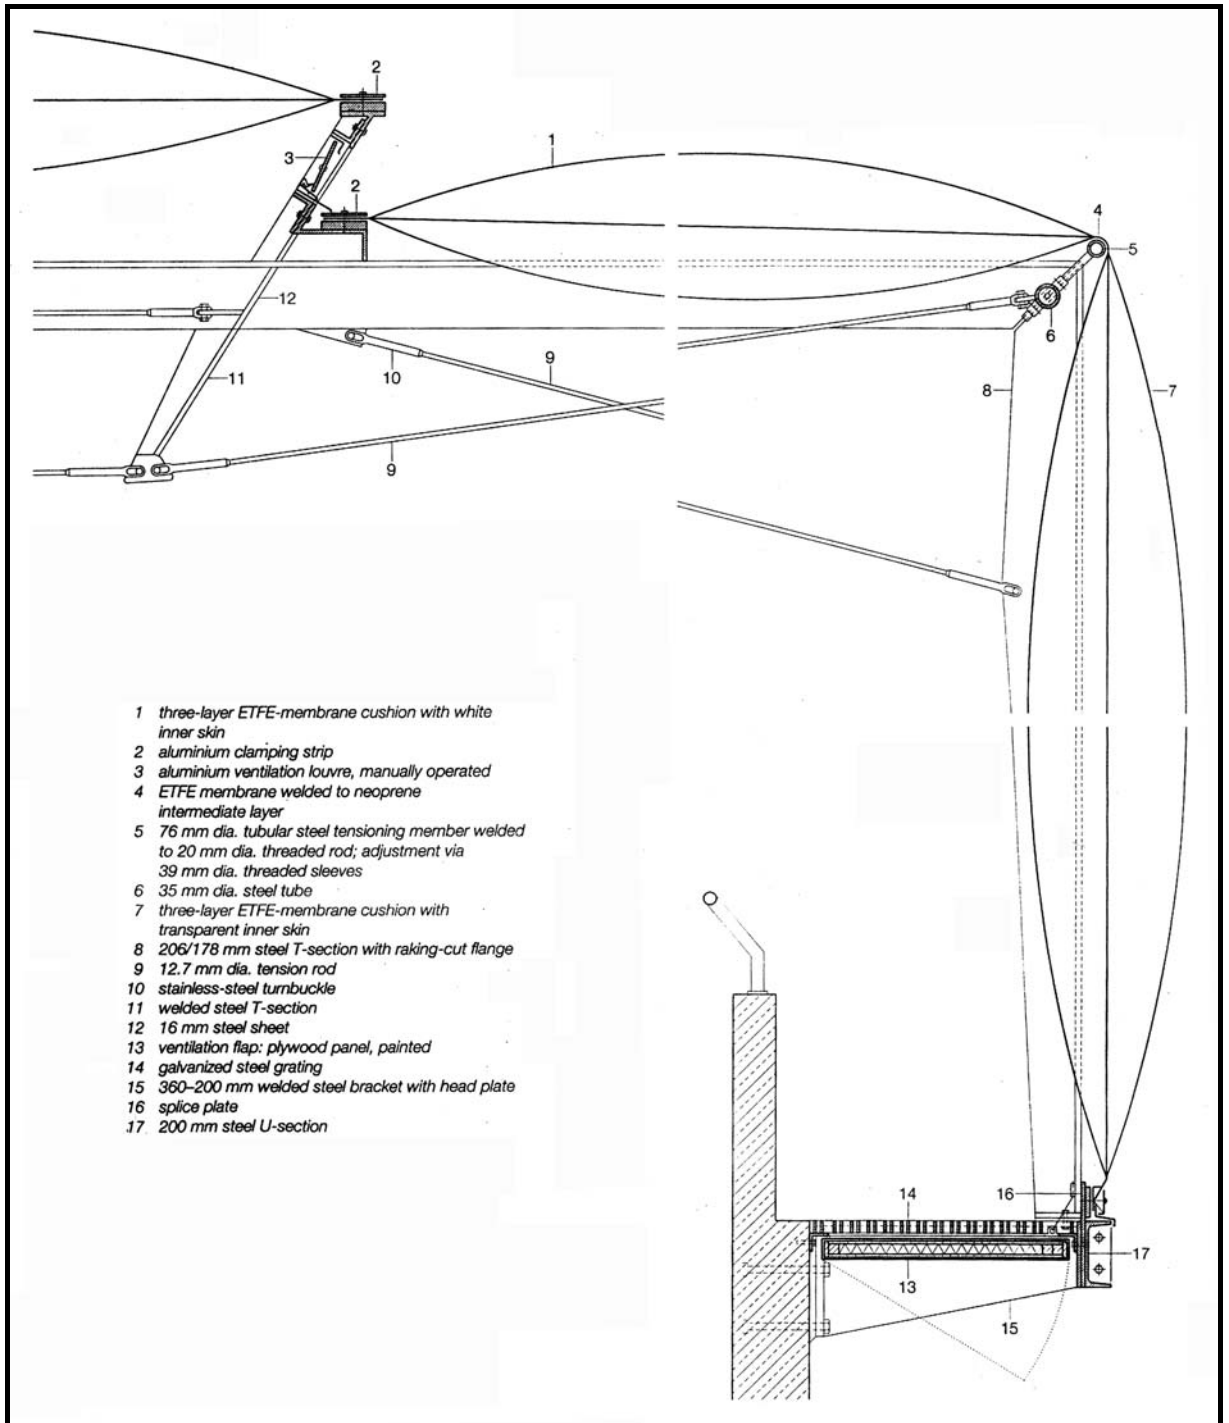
Earth Center IPS Detail of the Roof and Facade
